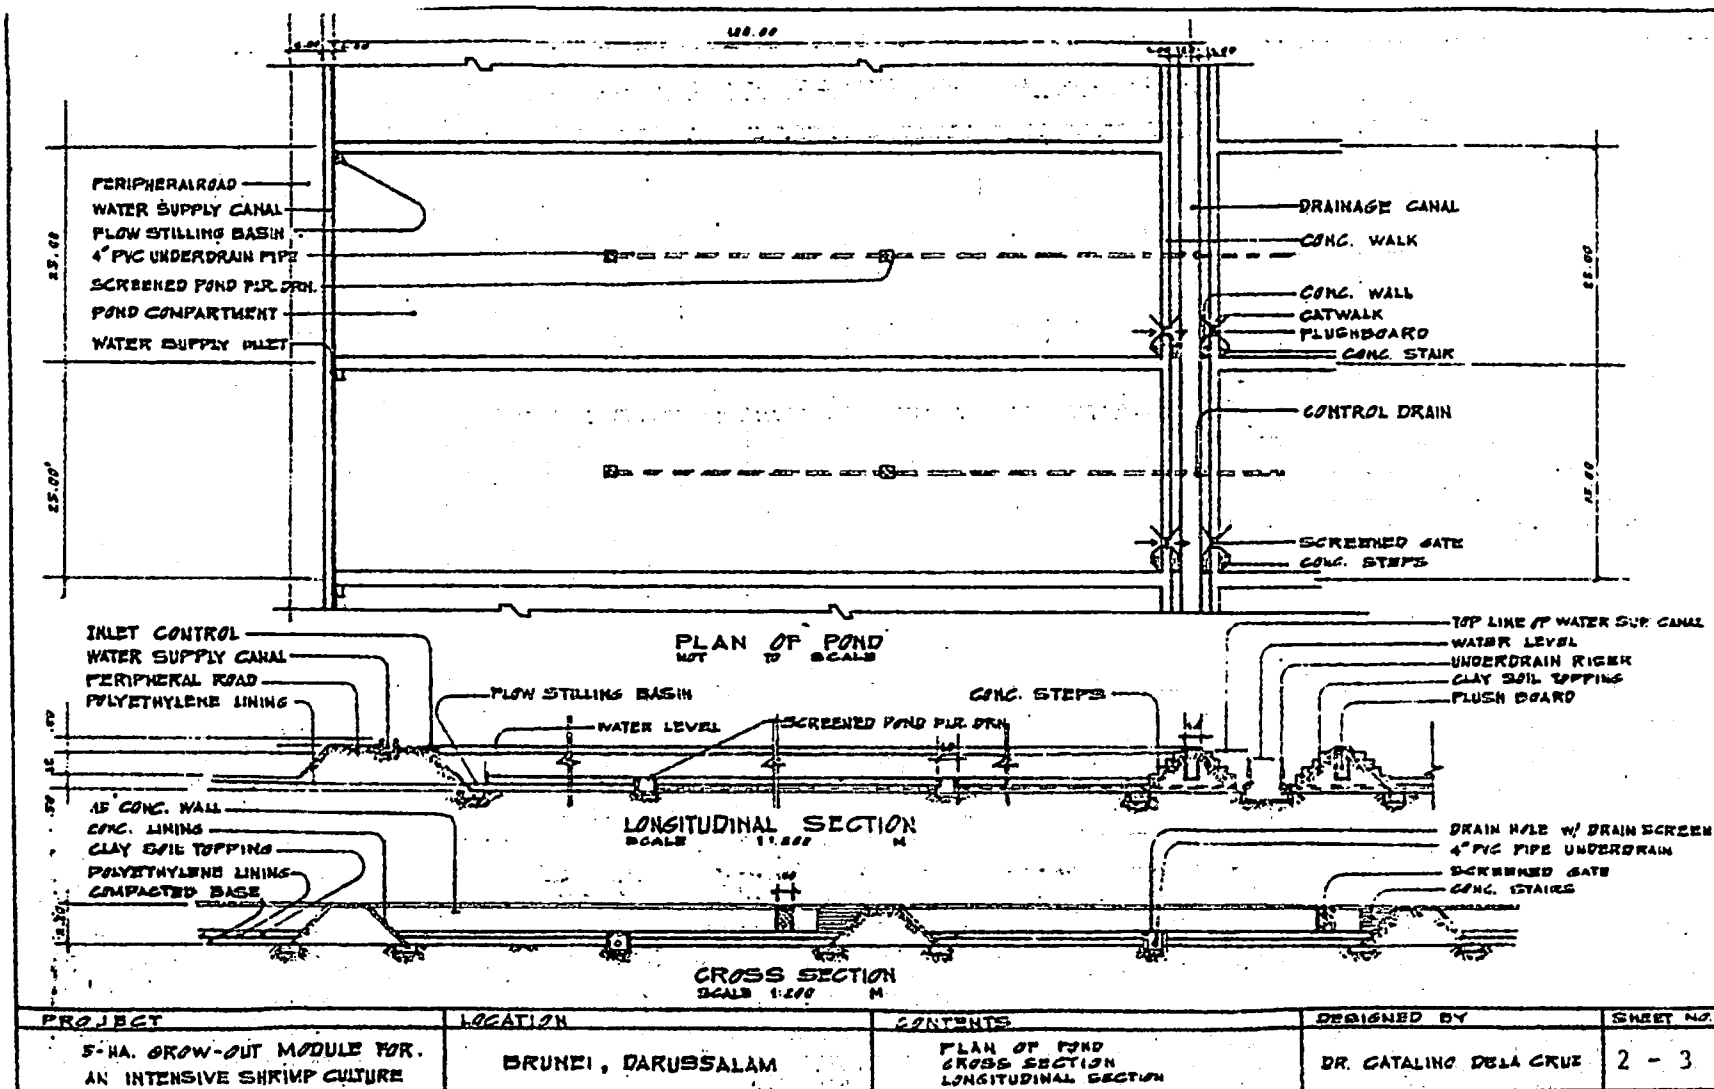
Cross-section of ponds and dikes (concrete-lined earthen ponds).
